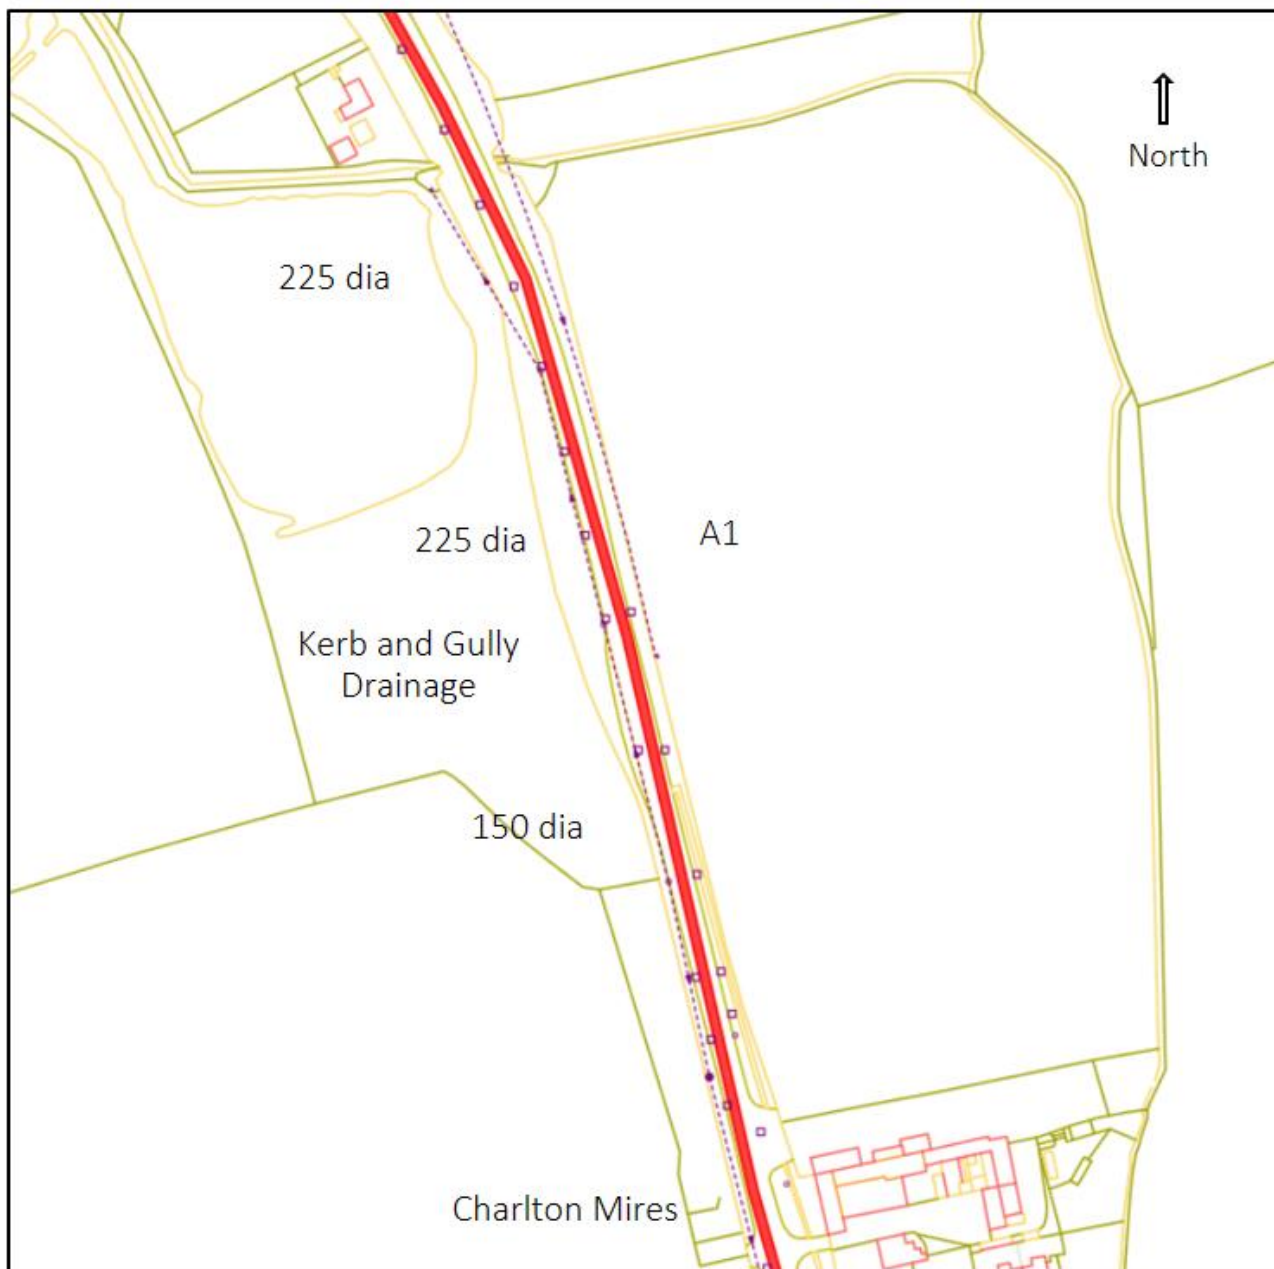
Highway Drainage Layout and Detention Basin DB27
